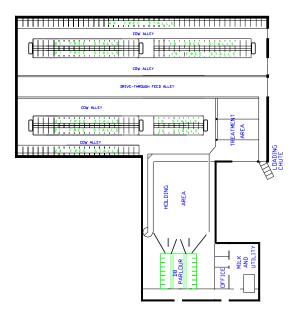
A. Layout permits expansion of barn to right, parlour to the bottom and holding area to the drive through.
